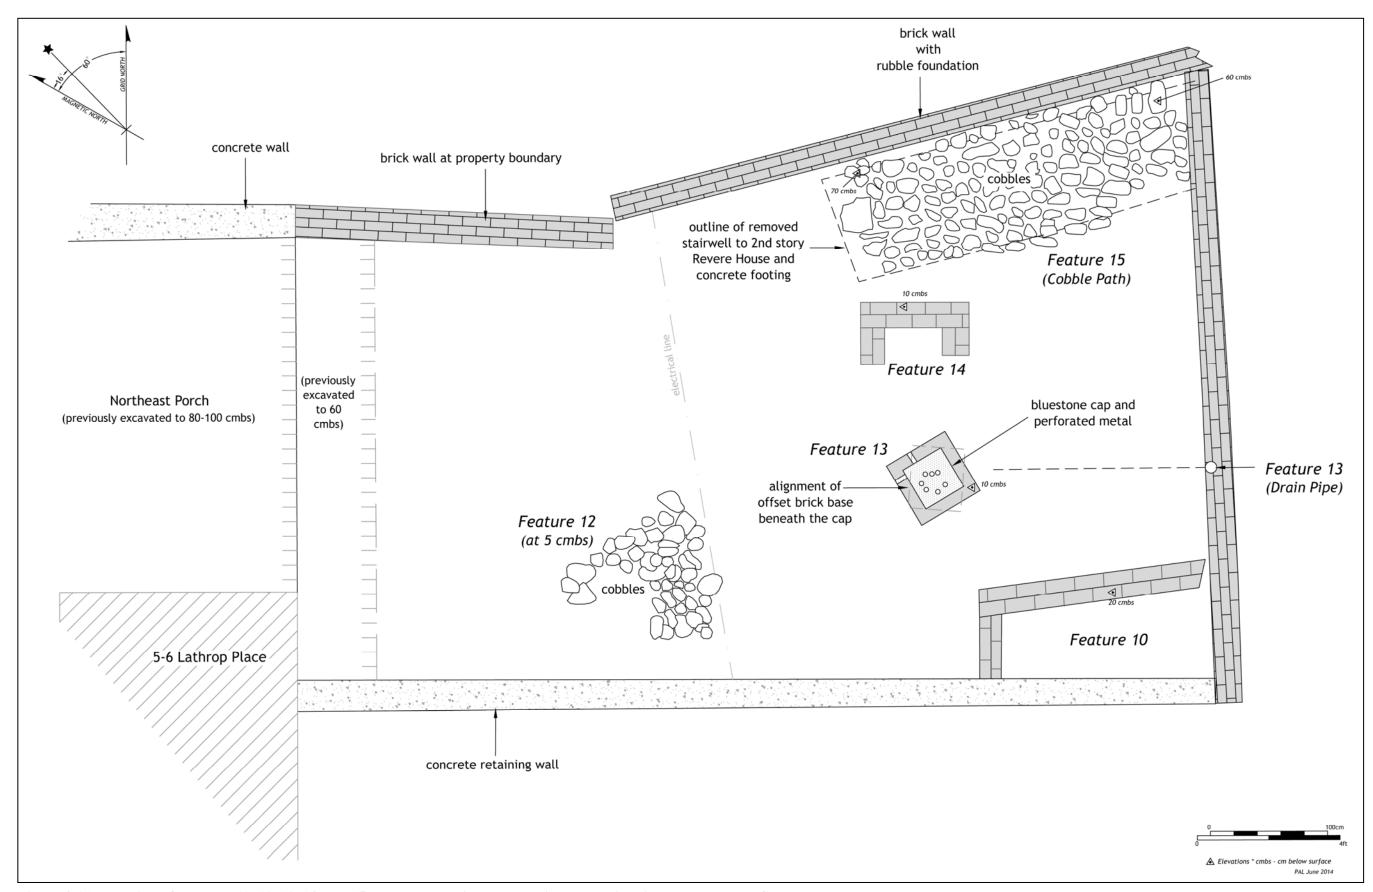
Plan view of Features 10, 12, 13, 14, and 15 as exposed during construction excavations in the Upper East Courtyard.
